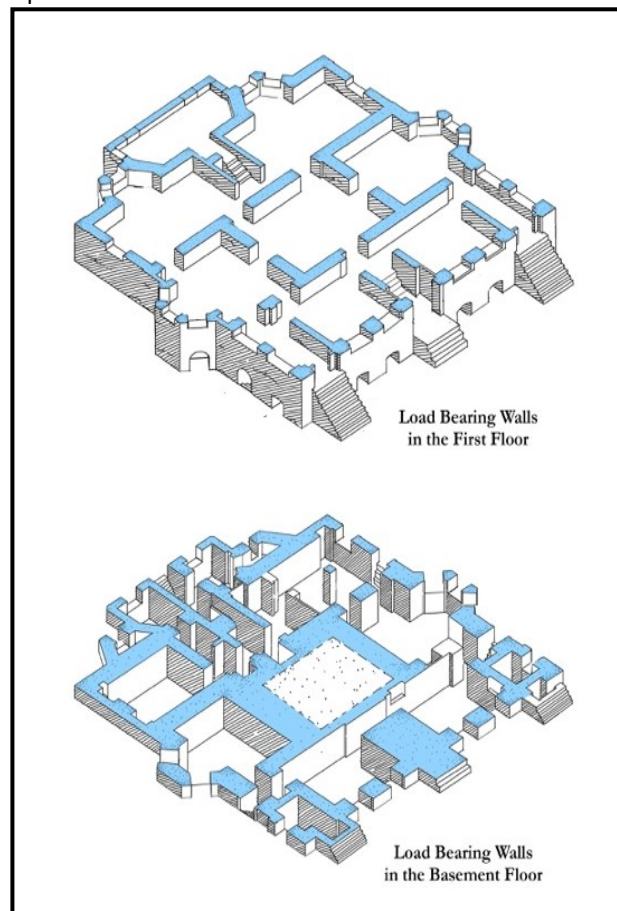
Load bearing and non-load-bearing walls in basement and ground levels; Source: Authors
